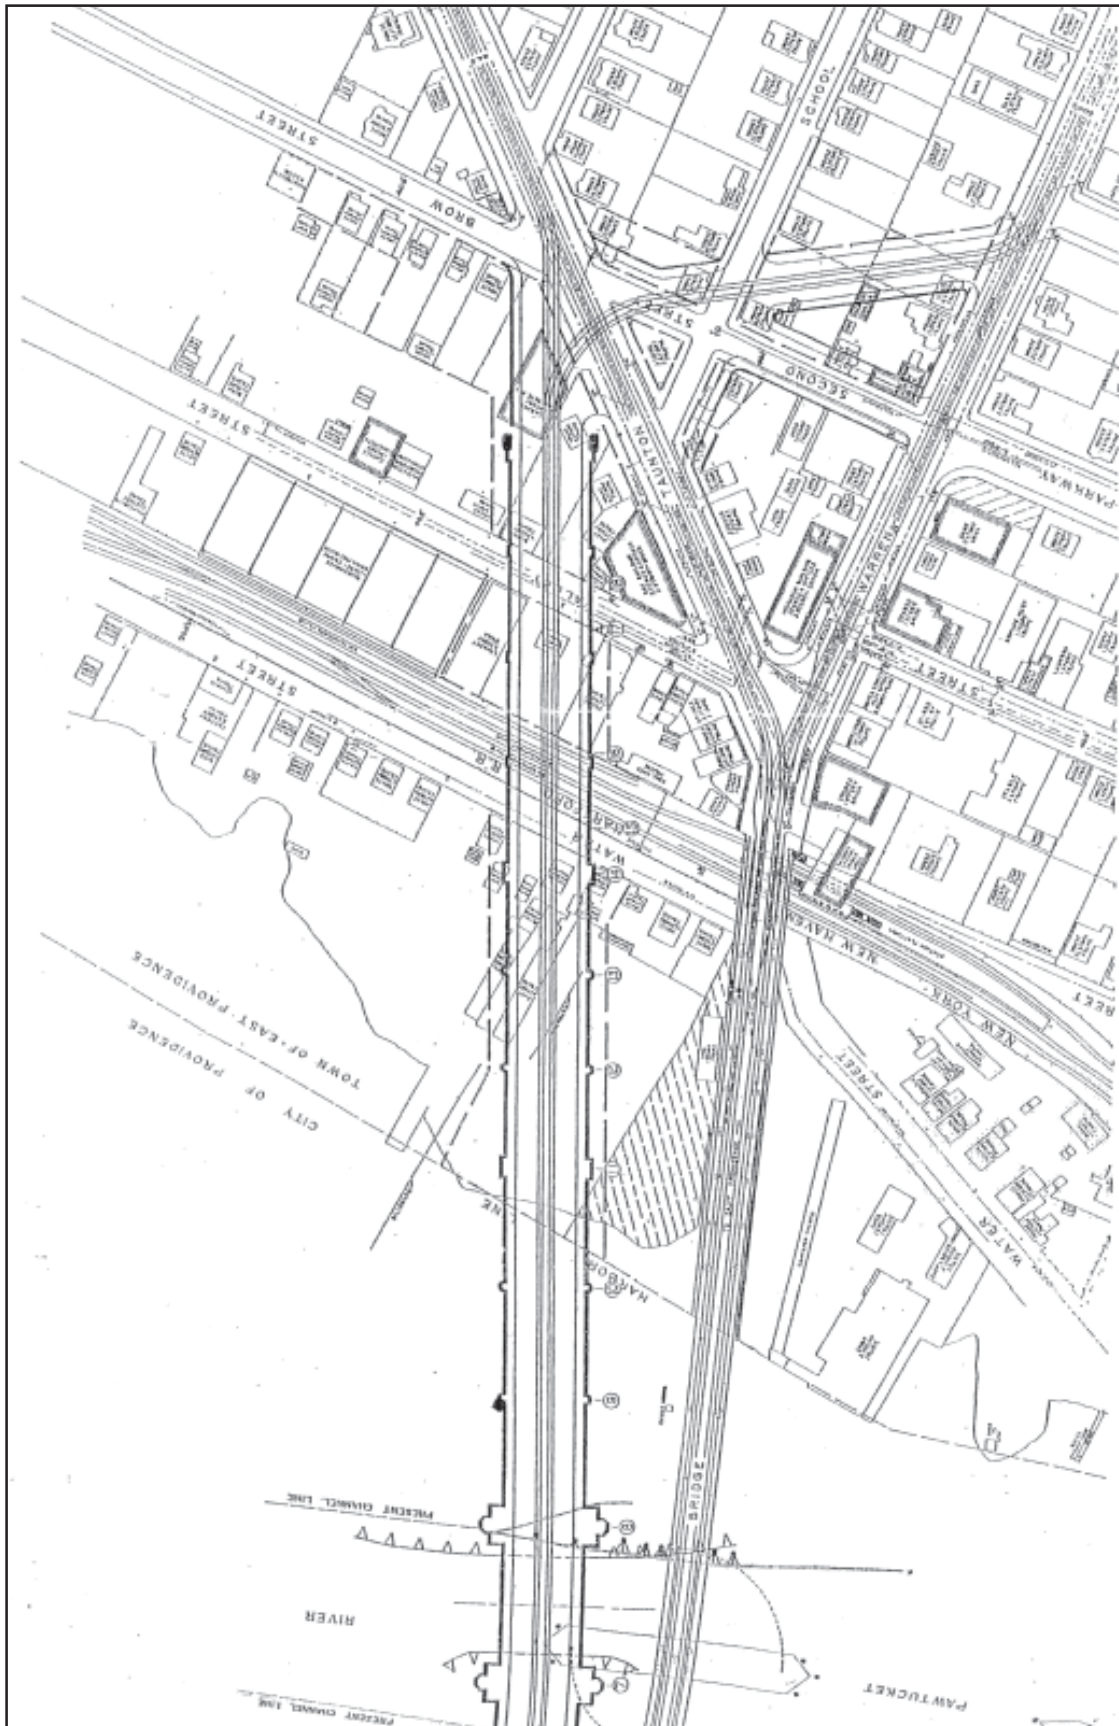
Plans depicting the 1885 Seckonk River Bridge and the proposed 1930 Washington Bridge alignments.
